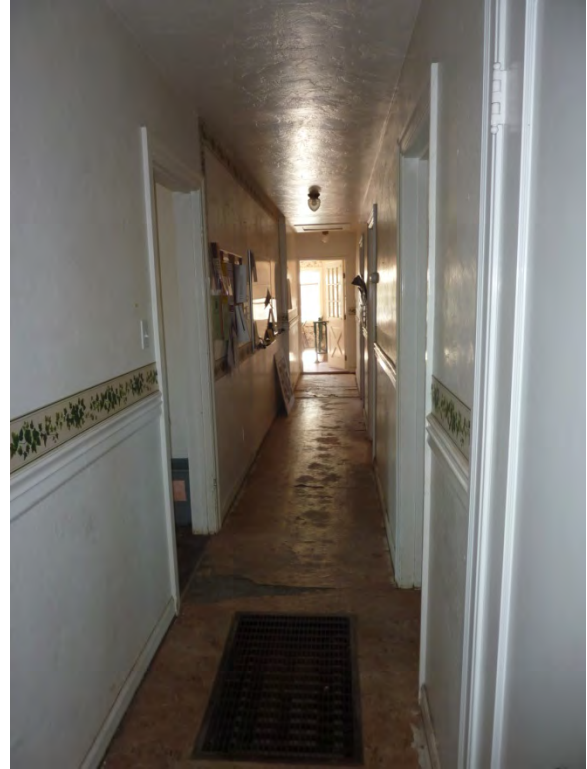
Hallway looking toward the kitchen. The door at the left is to the entrance hall. The door in the right foreground is the linen closet, the next door is the bathroom and the next two doors are bedrooms.
